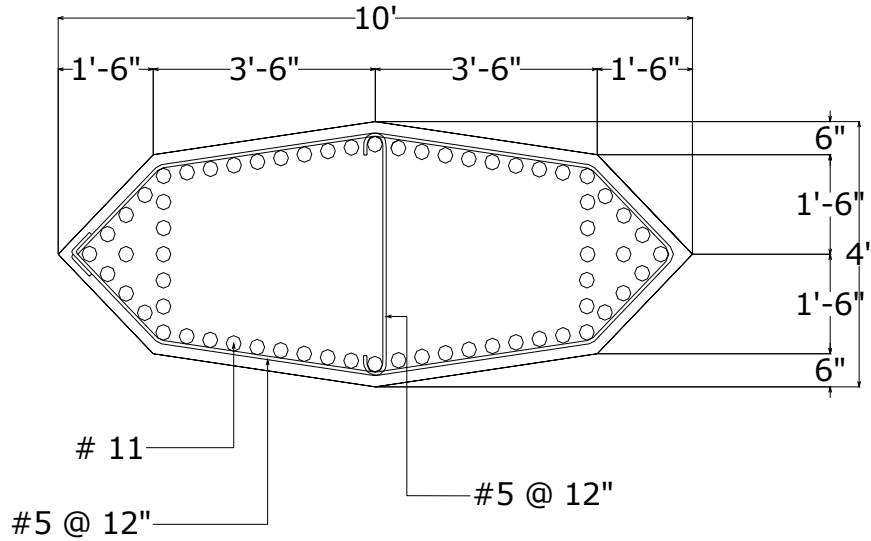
Cross section of 19WL, 22WL and 23WL Columns of 1RWL-2RWL Off-Ramp (drawing not to scale)
